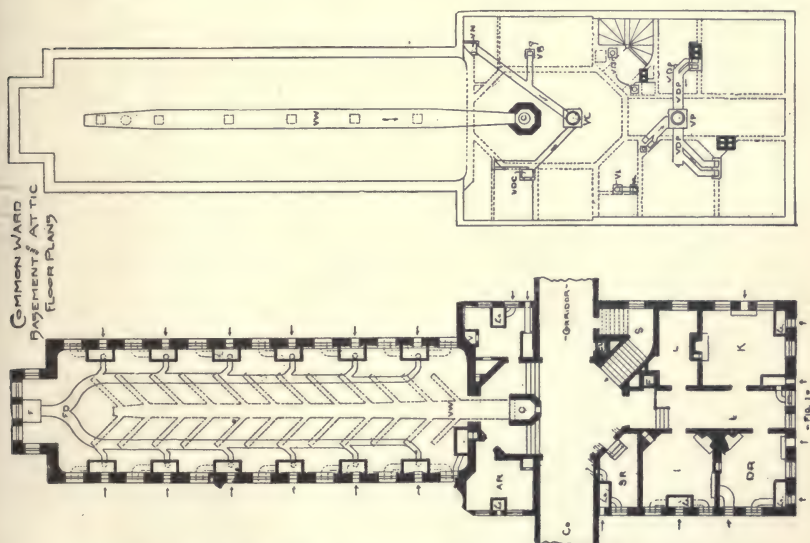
BASEMENT AND ATTIC PLANS OF COMMON WARD.
